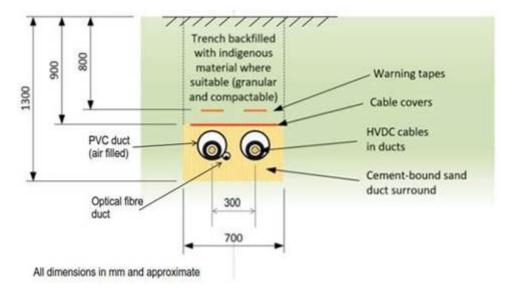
Typical HVDC Trench Cross-Section (source: WSP | not to scale)
